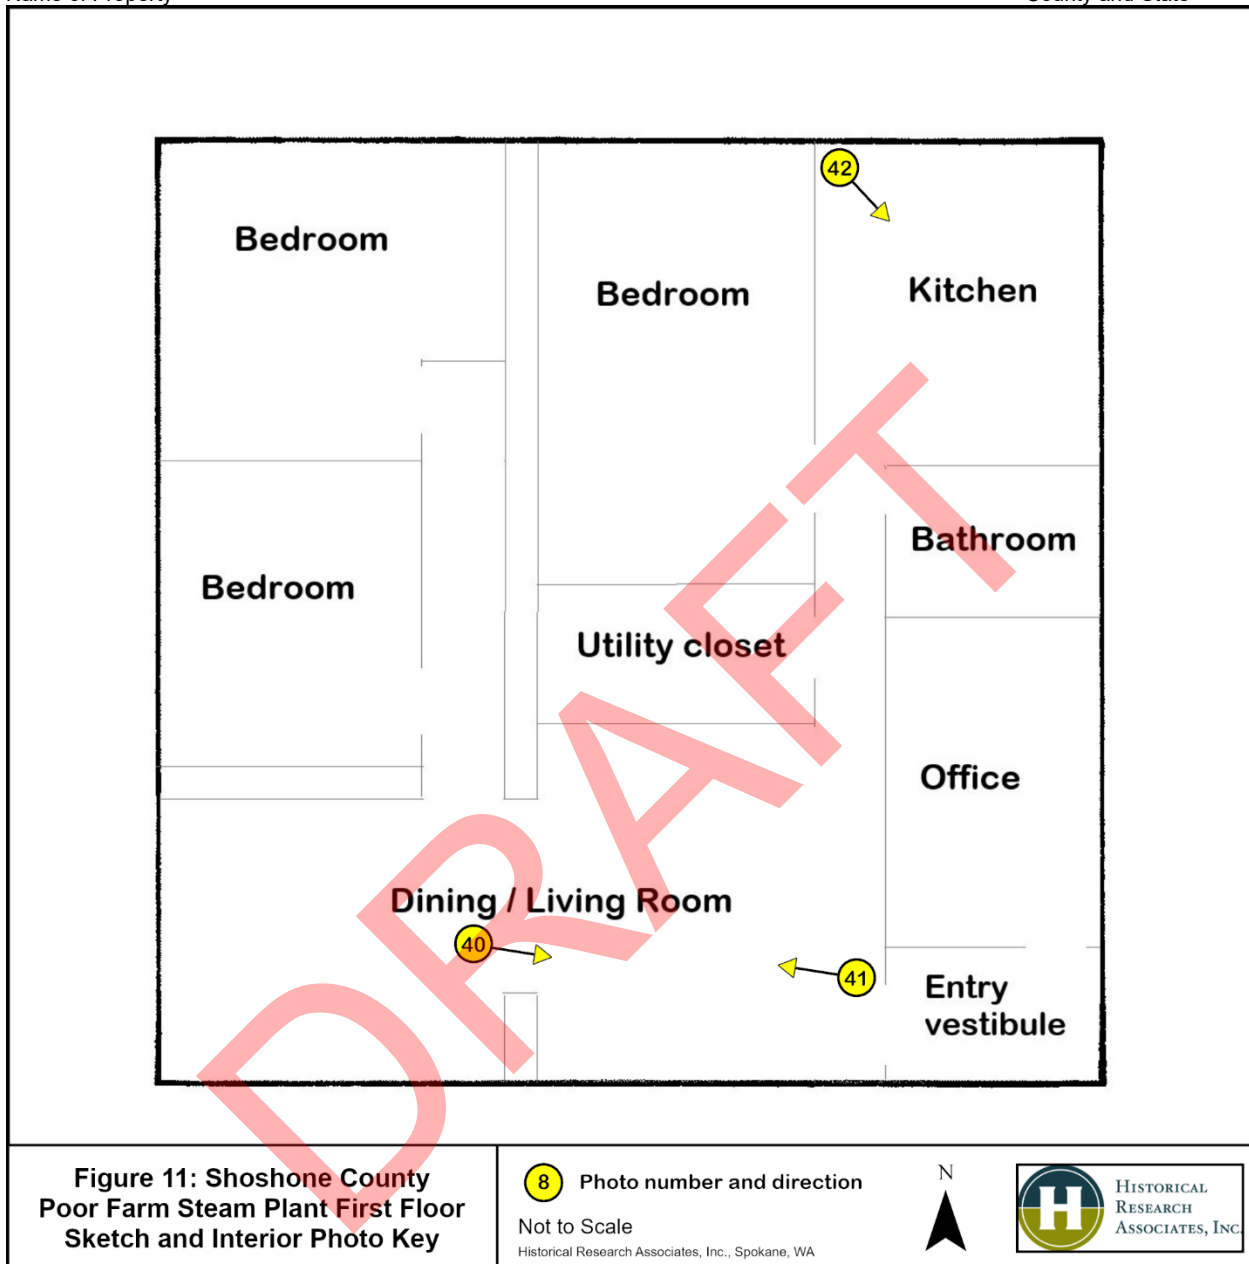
Shoshone County Poor Farm Steam Plant first floor sketch and interior photo key.
